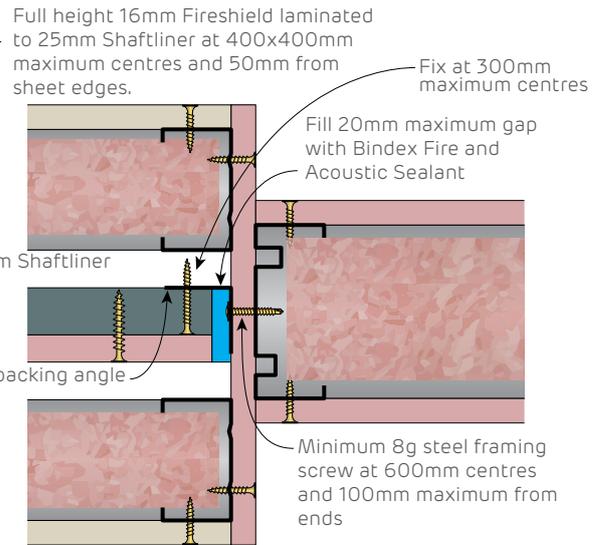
Interhome Highrise Wall Transition to Single Stud Fire Rated Plasterboard Wall Plan
